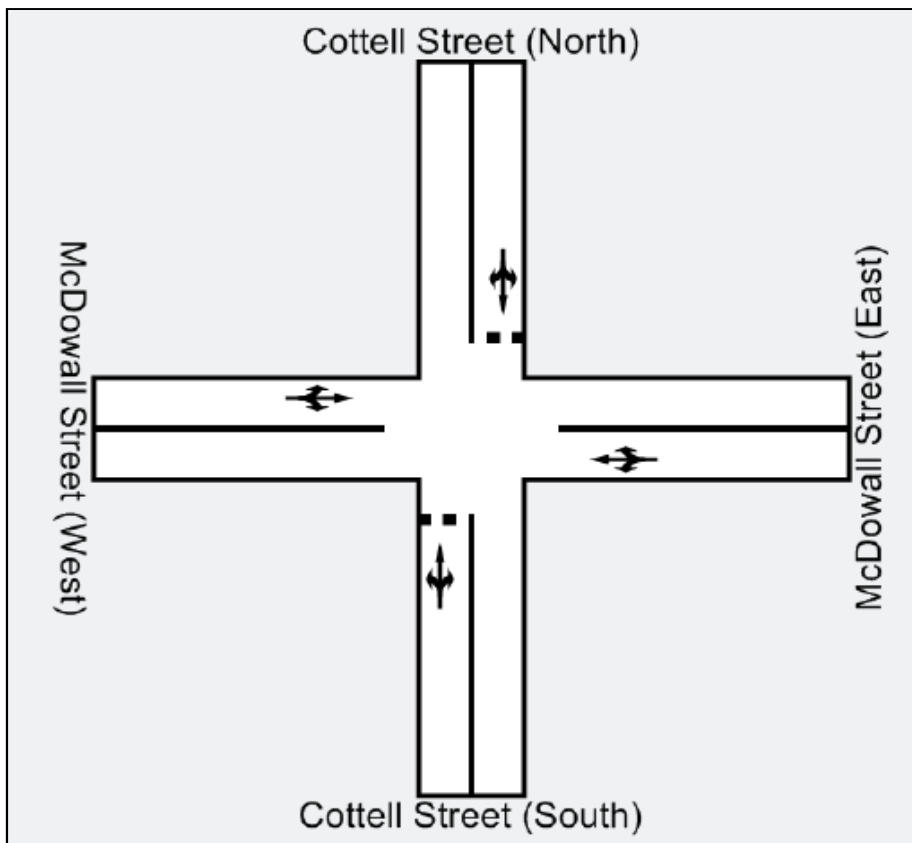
Existing Configuration of the McDowall Street/Cottell Street Intersection
